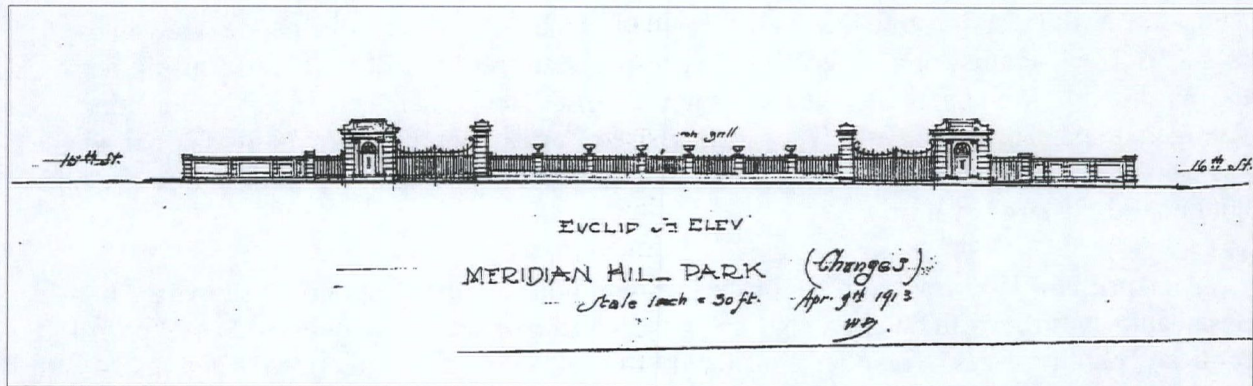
1913 elevation of the proposed Euclid Street entrance to Meridian Hill Park (National Archives RG 79, 327.46A).
